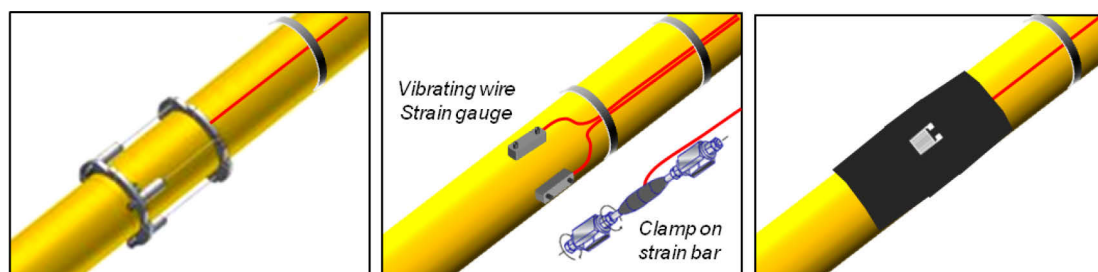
From left to right, clamped on strain collar with 4 LVDT's, bolted or clamped VW strain gauges and glued or welded strain gauges inside potted seal
